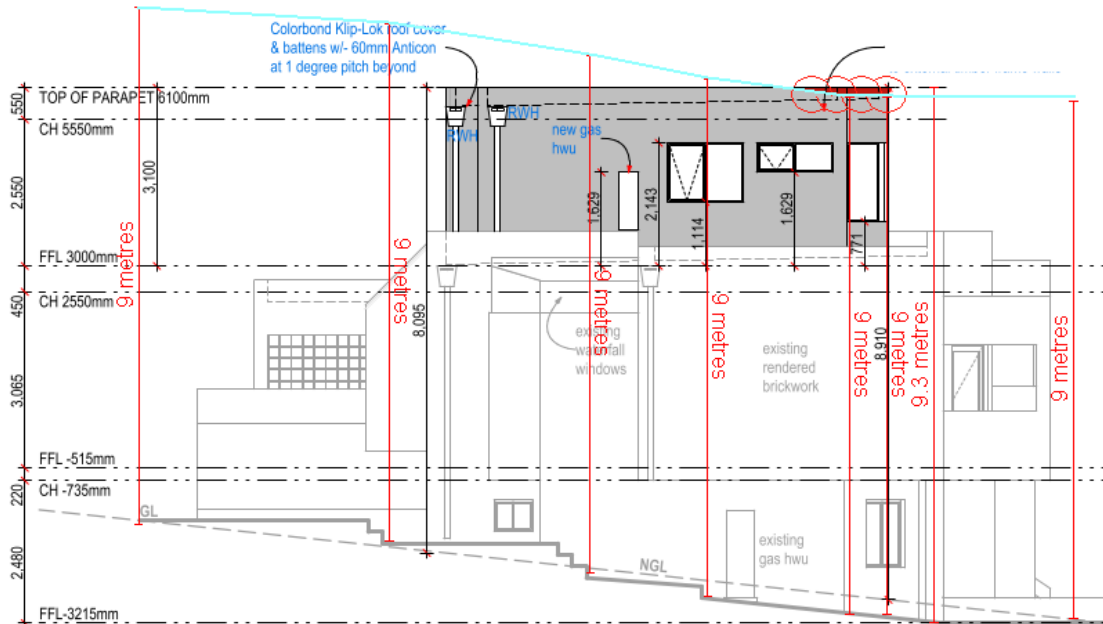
Southern elevation of the proposed works. The blue line denotes the deemed to comply height limit of 9 metres and the red shading denotes the modest section of wall above the deemed to comply limit.
